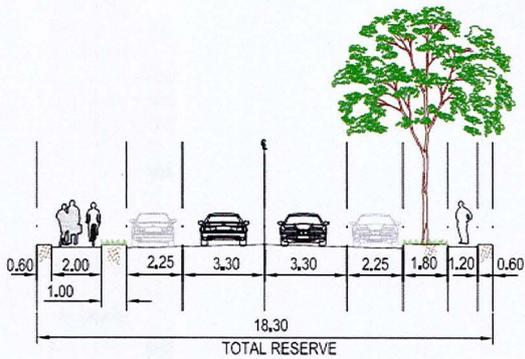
Road Type 6: Proposed Local Street with Shared Path
